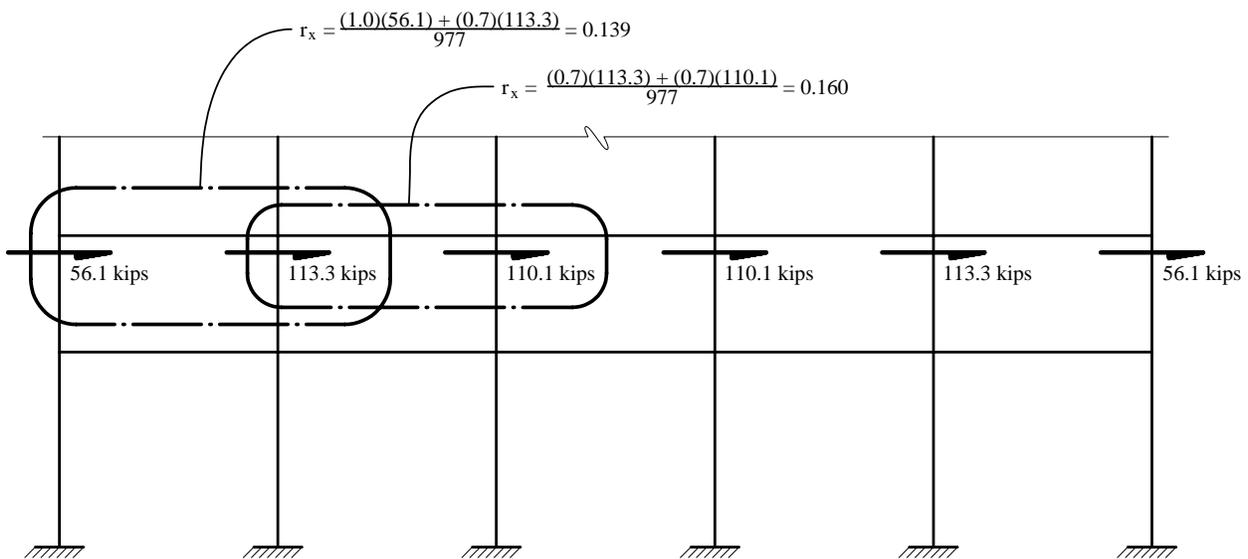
Column shears for N-S direction (partial elevation, Level 3) (1.0 kip = 4.45 kN).
